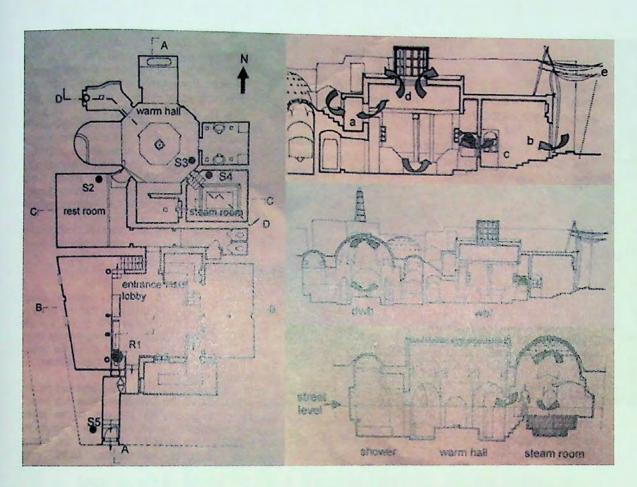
Plan & Sections of Hammam Bab al-Bahr in Cairo. Source: Bouillot, 2006.
